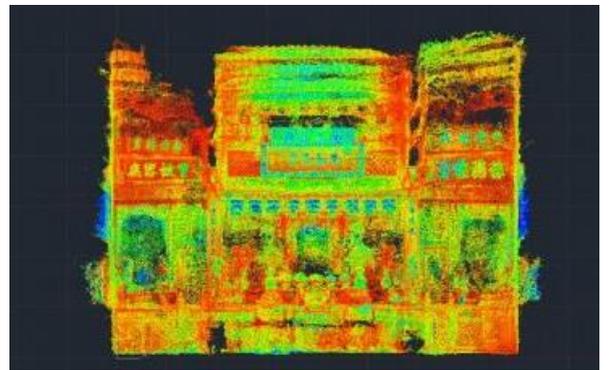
Photogrammetry – Cross Section Point Cloud of Main Hall
